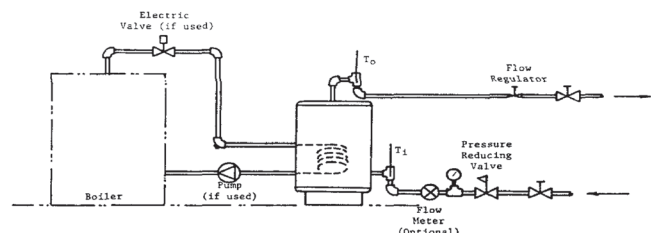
Type I appliances—typical piping arrangement, integrated heater, domestic water in external tank.
